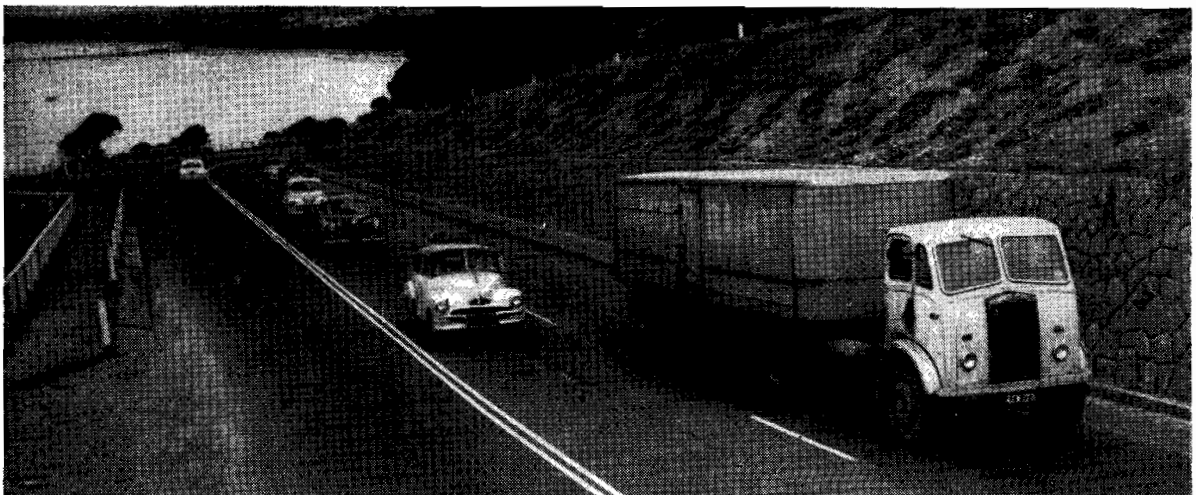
Traffic on Nepean Highway at Oliver's Hill with milk transport in slow traffic lane, showing wall built to prevent erosion.
